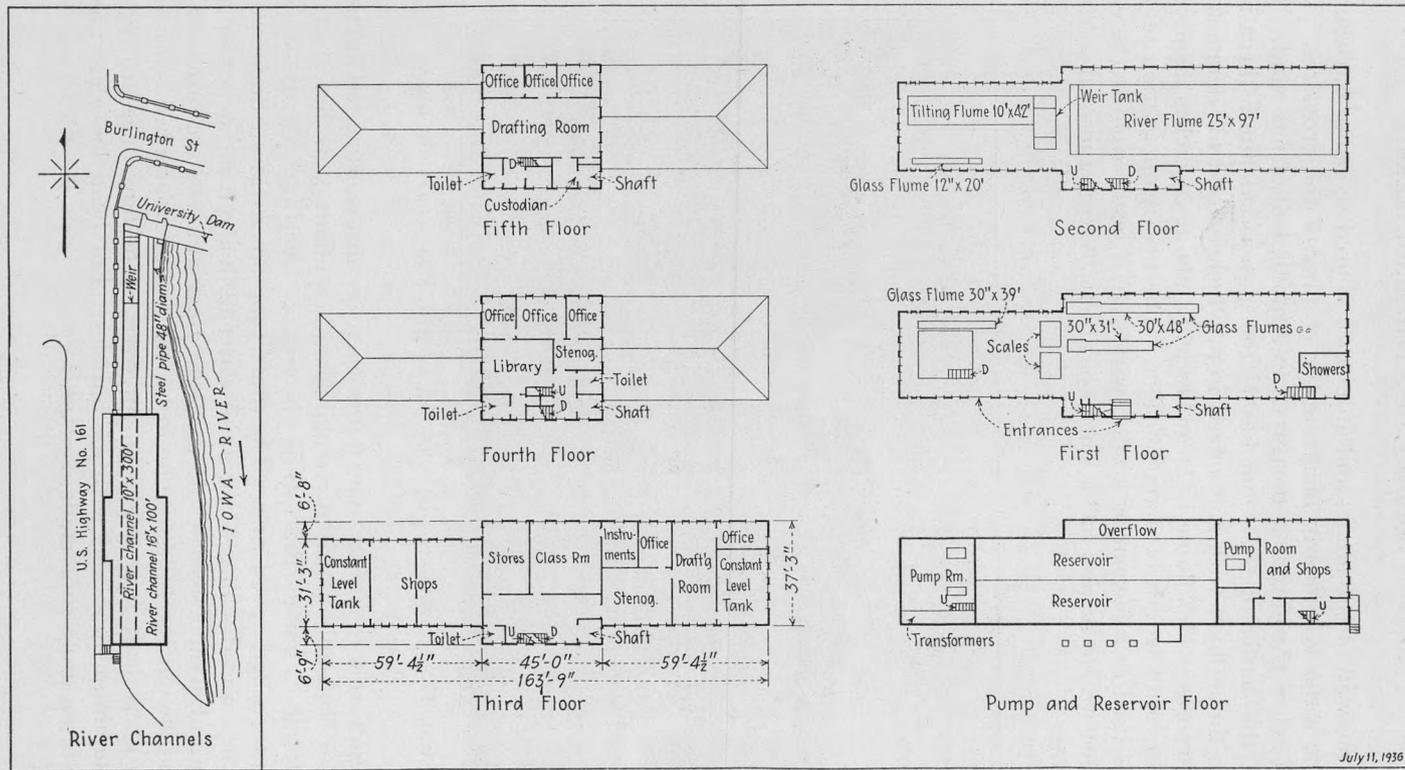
FLOOR PLANS OF LABORATORY AT IOWA INSTITUTE OF HYDRAULIC RESEARCH, UNIVERSITY OF IOWA, IOWA CITY
